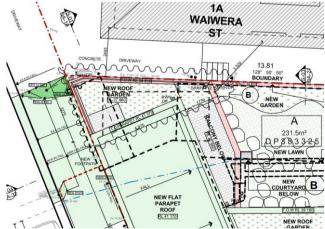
Part of Site Plan showing increase in RL of boundary wall and increased roof garden
